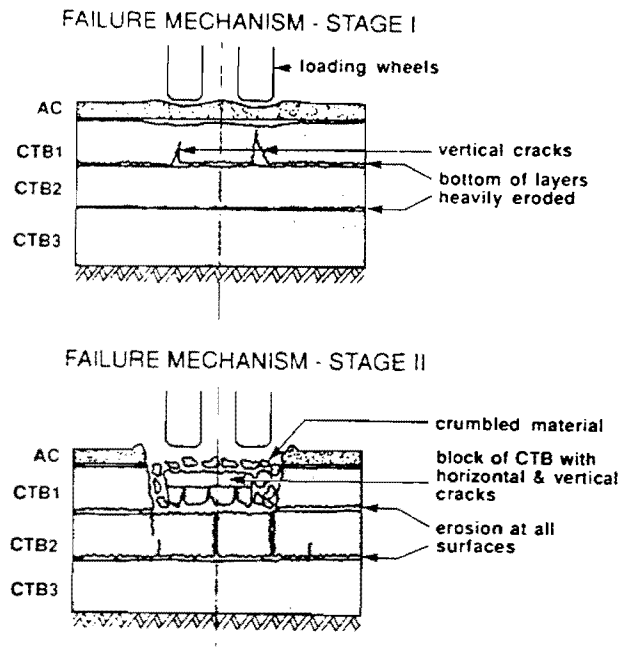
Failure of a Three Layer CTB Pavement (Kadar et al., (17)).
